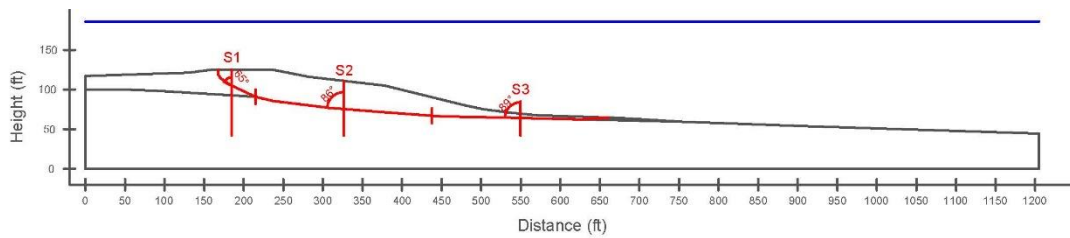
Sub-sectioning of the cross-section and failure plane for Nerlerk Embankment Slide 2
